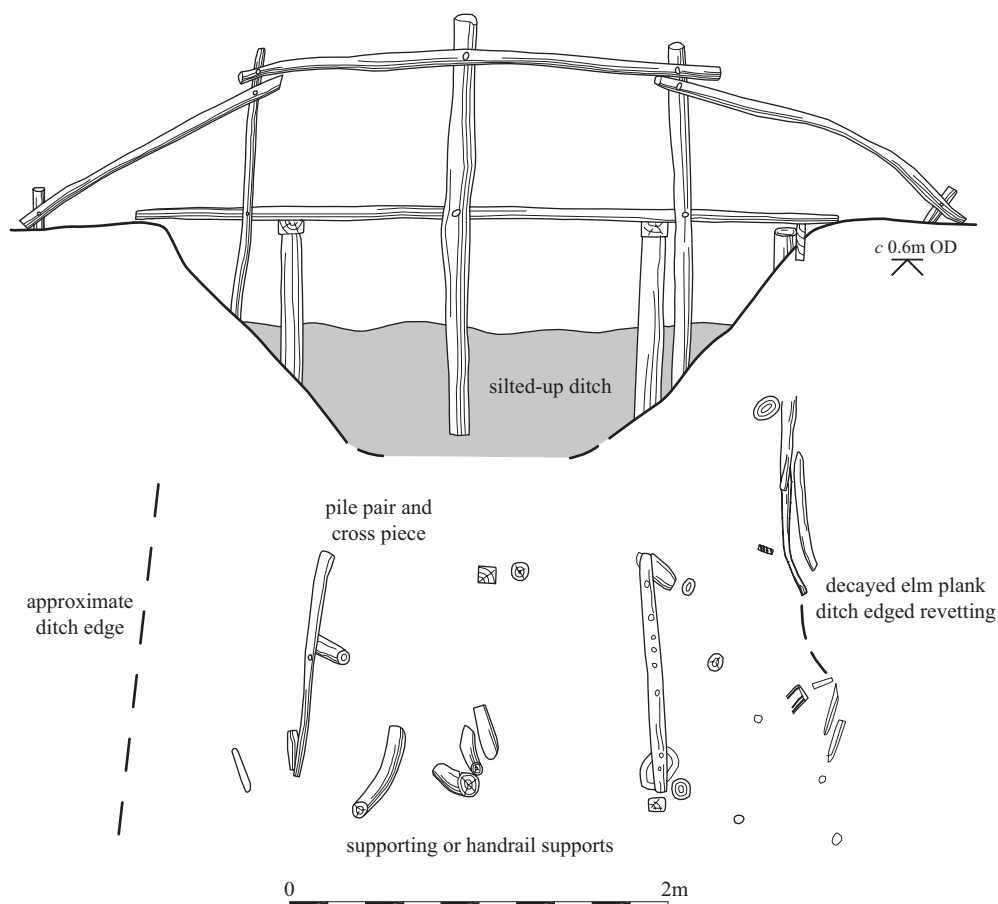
Bermondsey Street, Southwark: a sketch reconstruction of the early 16th century footbridge.
